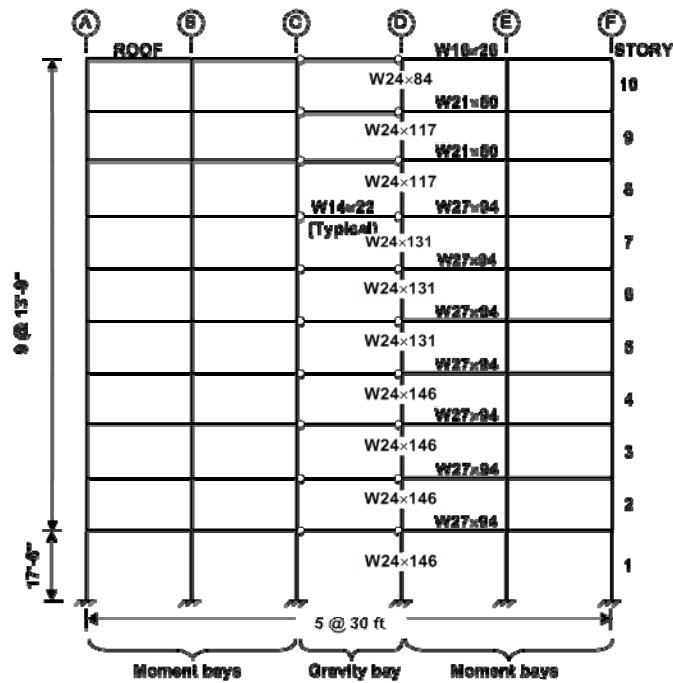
SMF Building Frame (SDC-D): E-W Elevation (Line 6)
